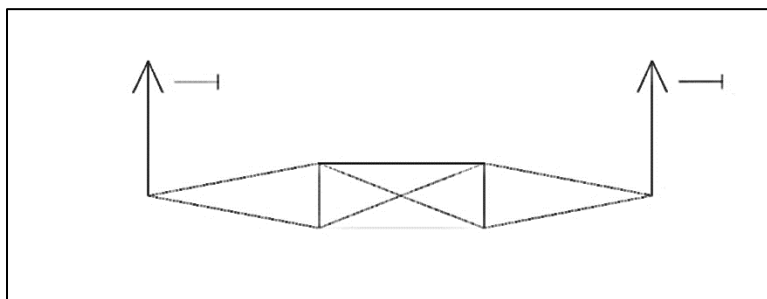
Dead end tower with longitudinal loads from all conductors/ground wire/OPGW on one side of the tower
